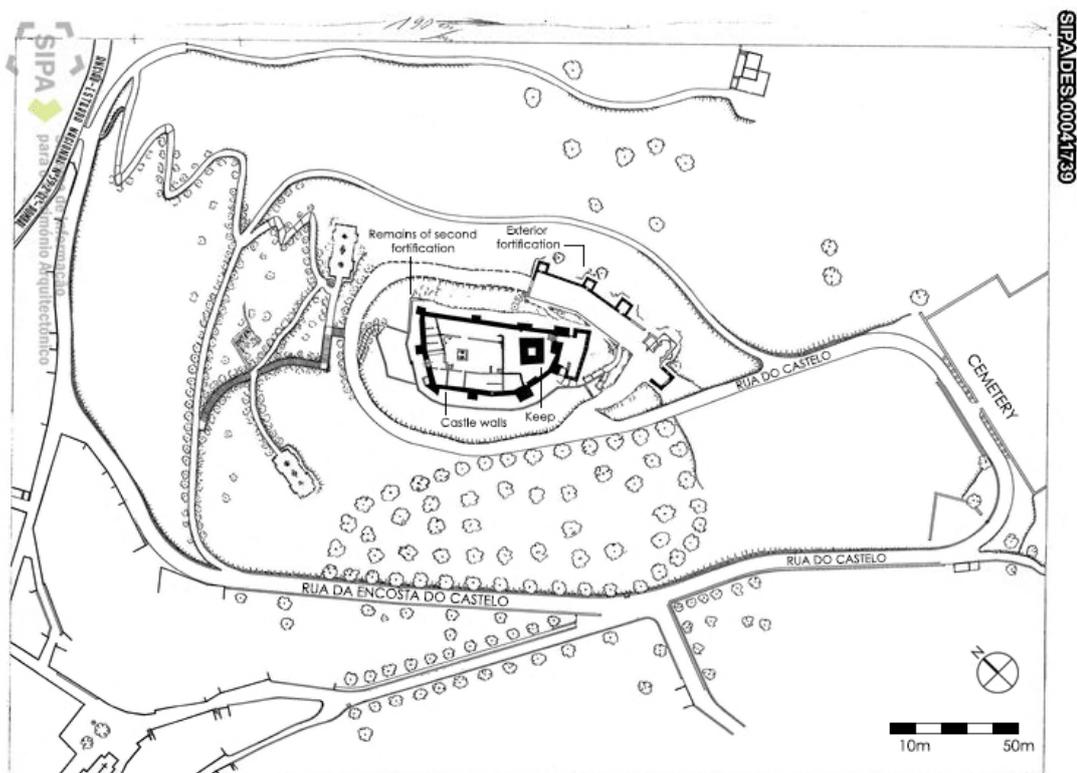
Site plan of Pombal Castle (Source: SIPA, n.d.)
